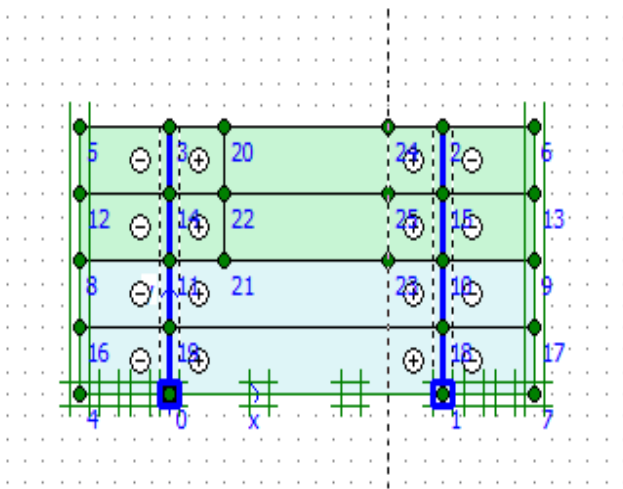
Geometry of the model with TSP III sheet pile for 12m
